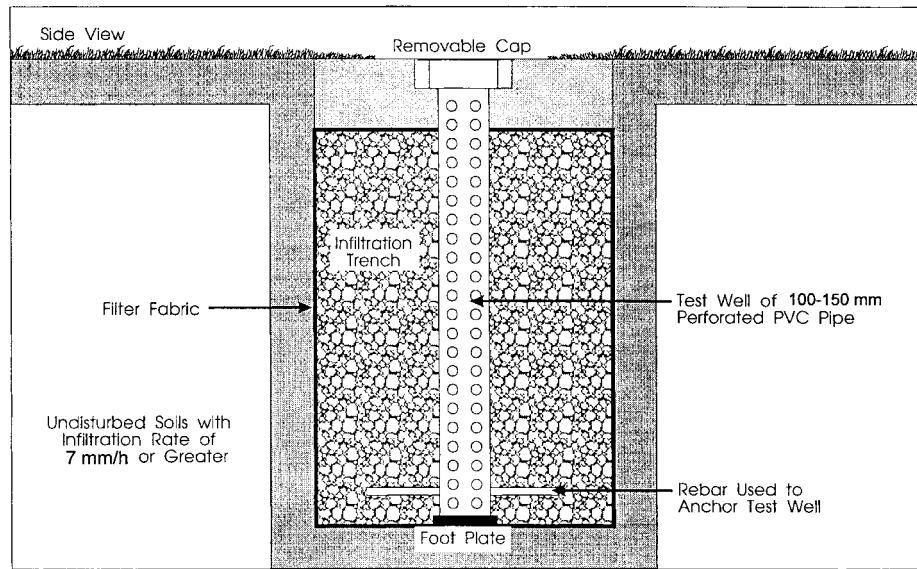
Infiltration Trench With Observation Well (after Schueler, 1987)
